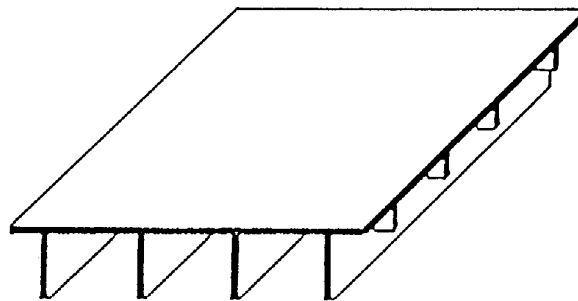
A steel plate reinforced by orthogonal stiffeners.
